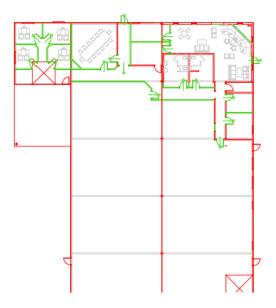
Conceptual New Floor Plan - Structures to remain highlighted in red, new structures highlighted in green.
